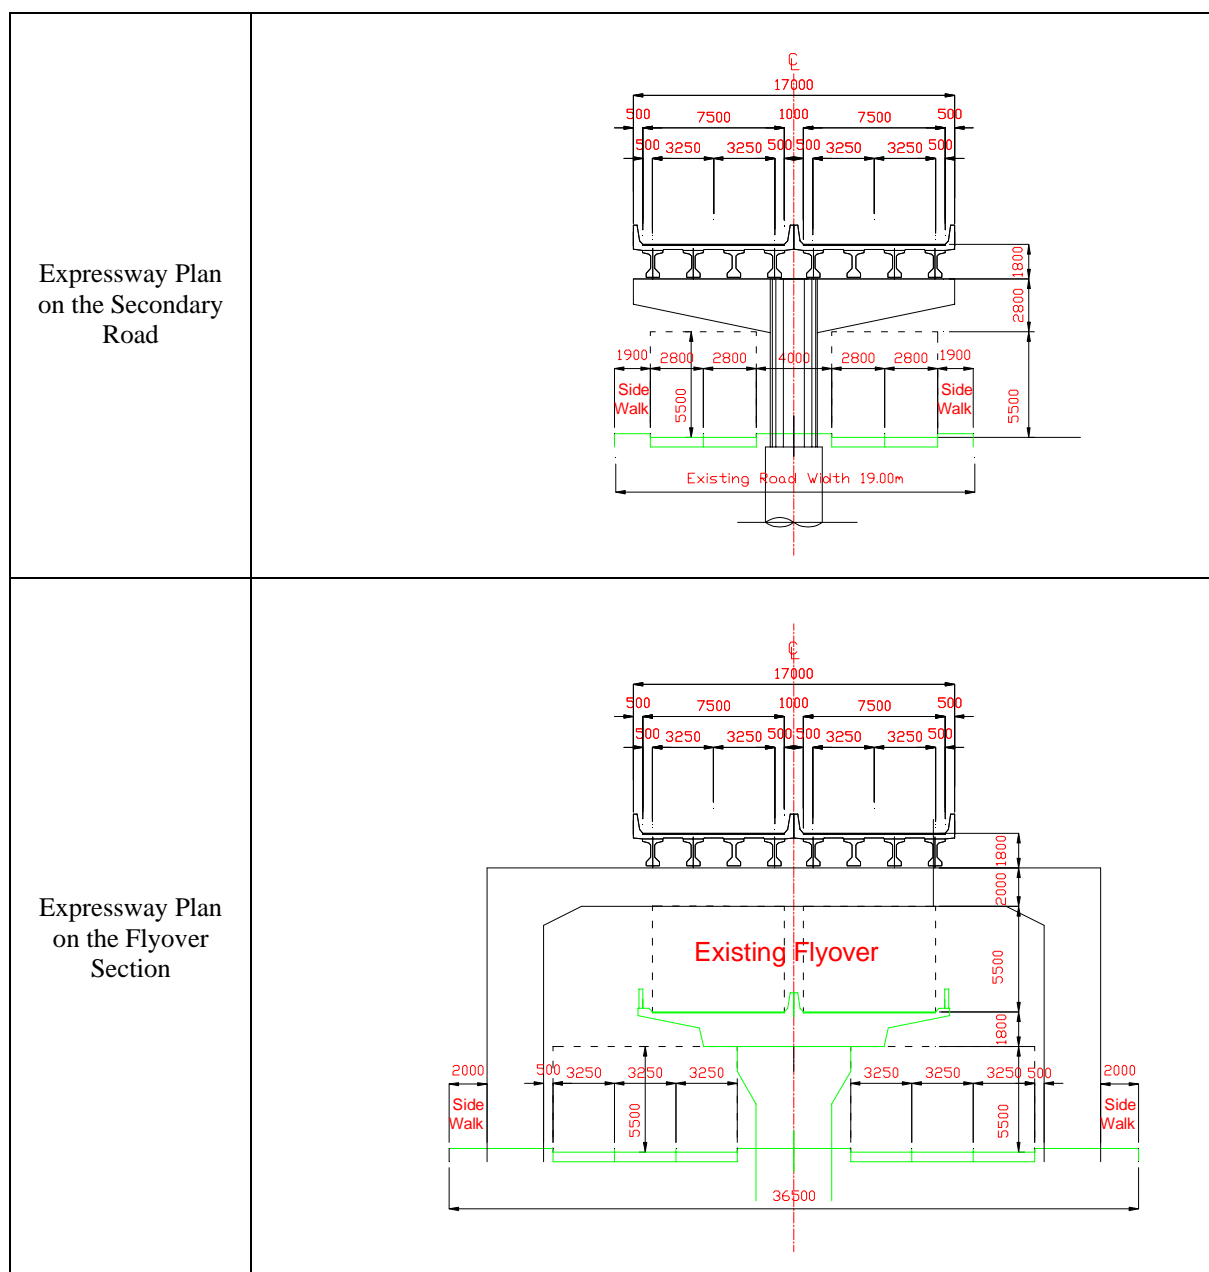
Expressway Plan on the Three Class Roads and Flyover Section
